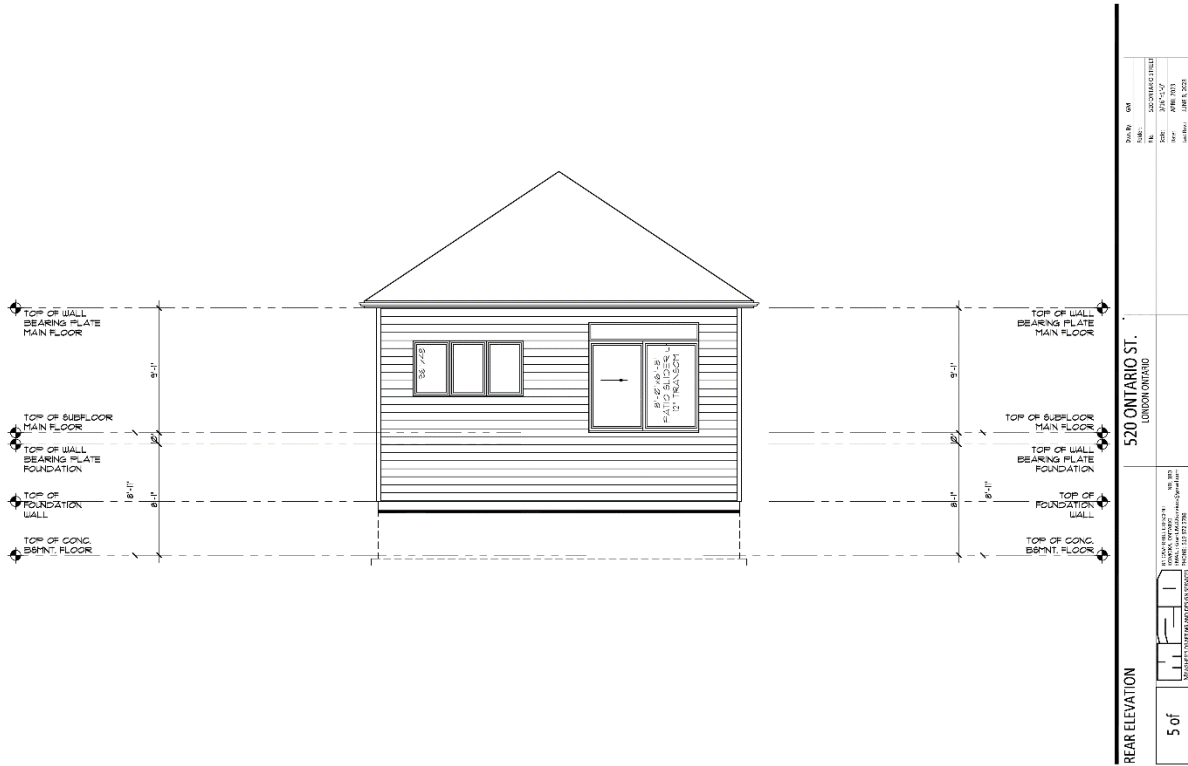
East elevation for proposed house on the subject property at 520 Ontario Street, Meaghers Drafting and Design Services, dated June 2023.
